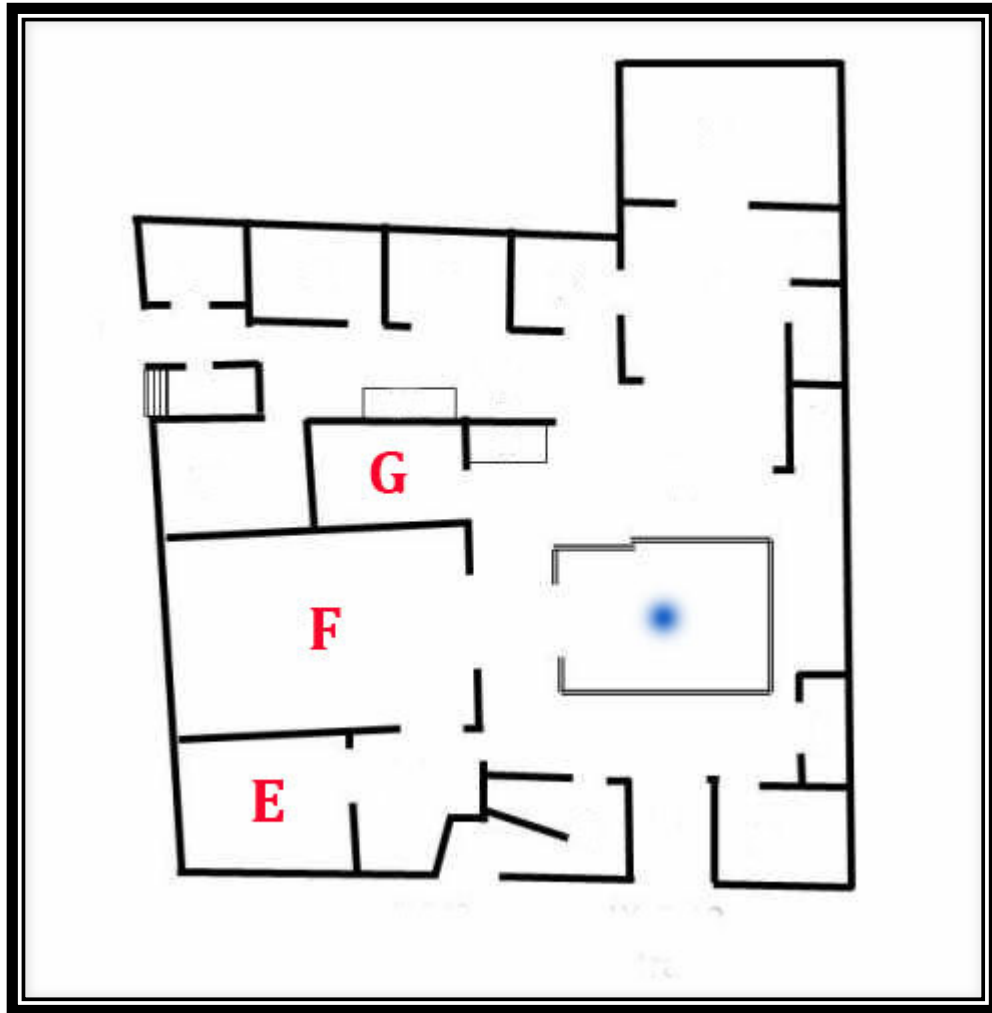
Plan of the House of Jason with Rooms E, F, G, and fountain indicated.
